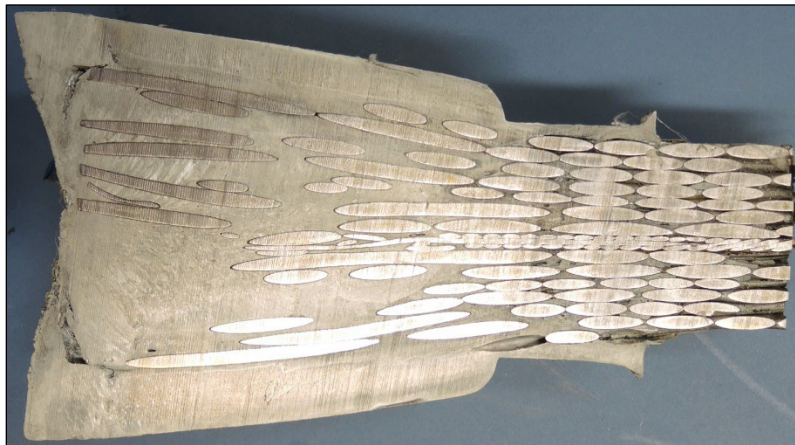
B4S_G casting cut open after load test to (photo: Socotec).
